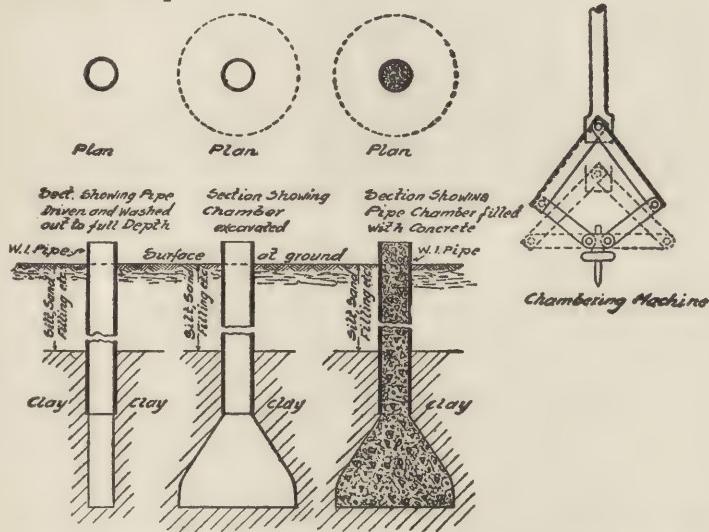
One Method of Poured Concrete Piling with Extended Footing.
